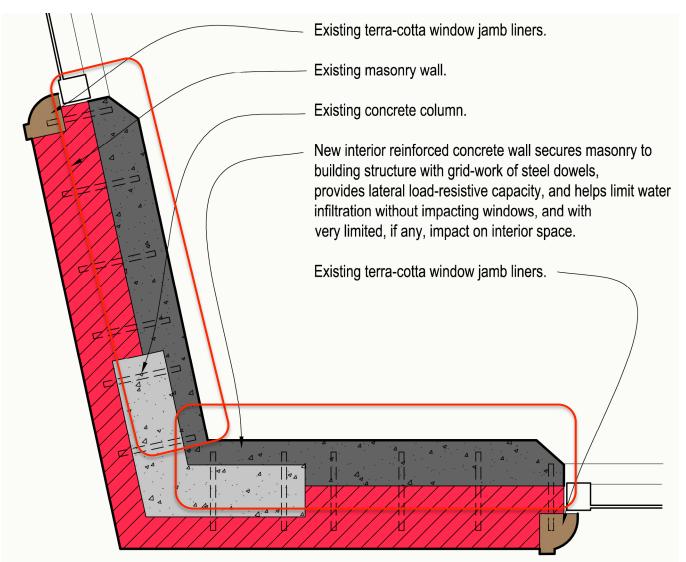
Possible Addition of Concrete Shear Walls at Building's SW Corner
